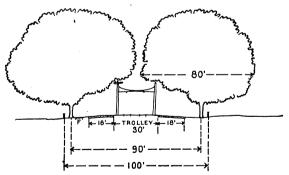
A 100-foot right-of-way with two 18-foot roadways and a 30-foot strip in the center available for trolley tracks. The trees are 45 feet from the center line, and the footpath (F) is inside the row of trees.
